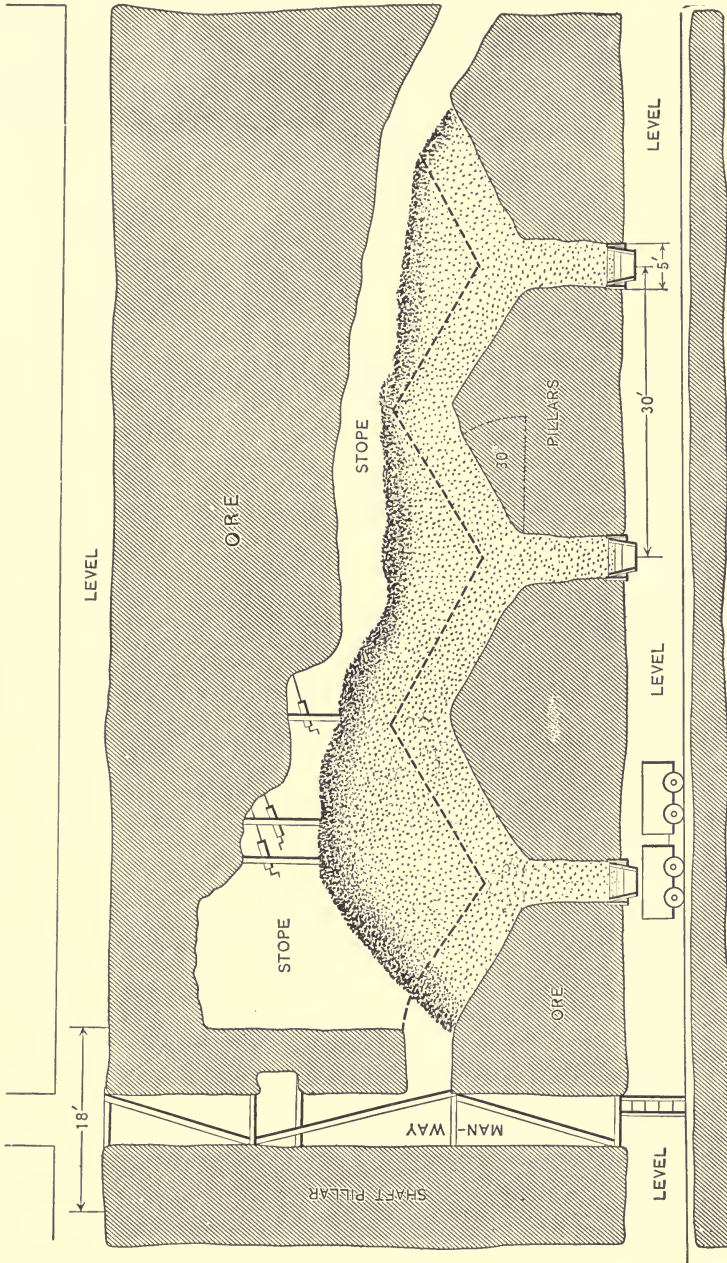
Longitudinal Section through Stope showing Method of Working by Shrinkage Stopping.
